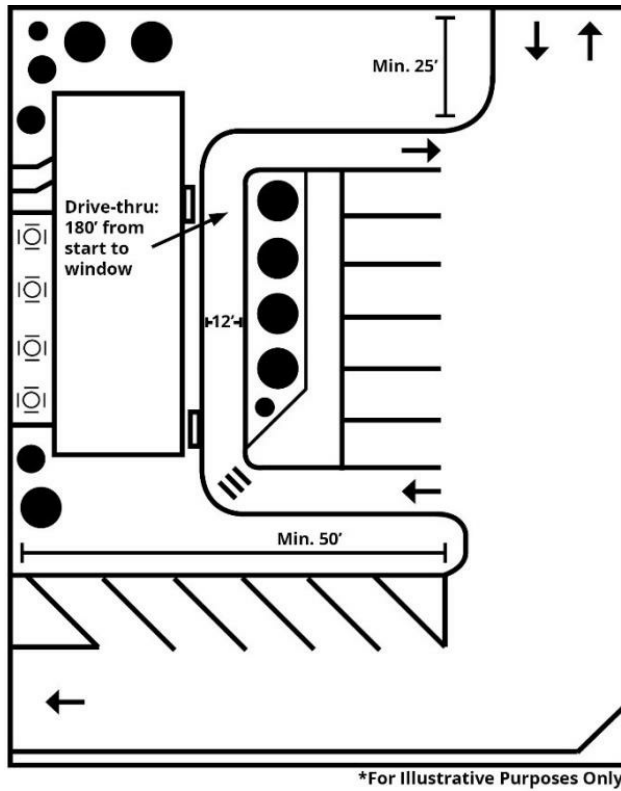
(2) Drive-thru Facility with Front Drive Aisle
